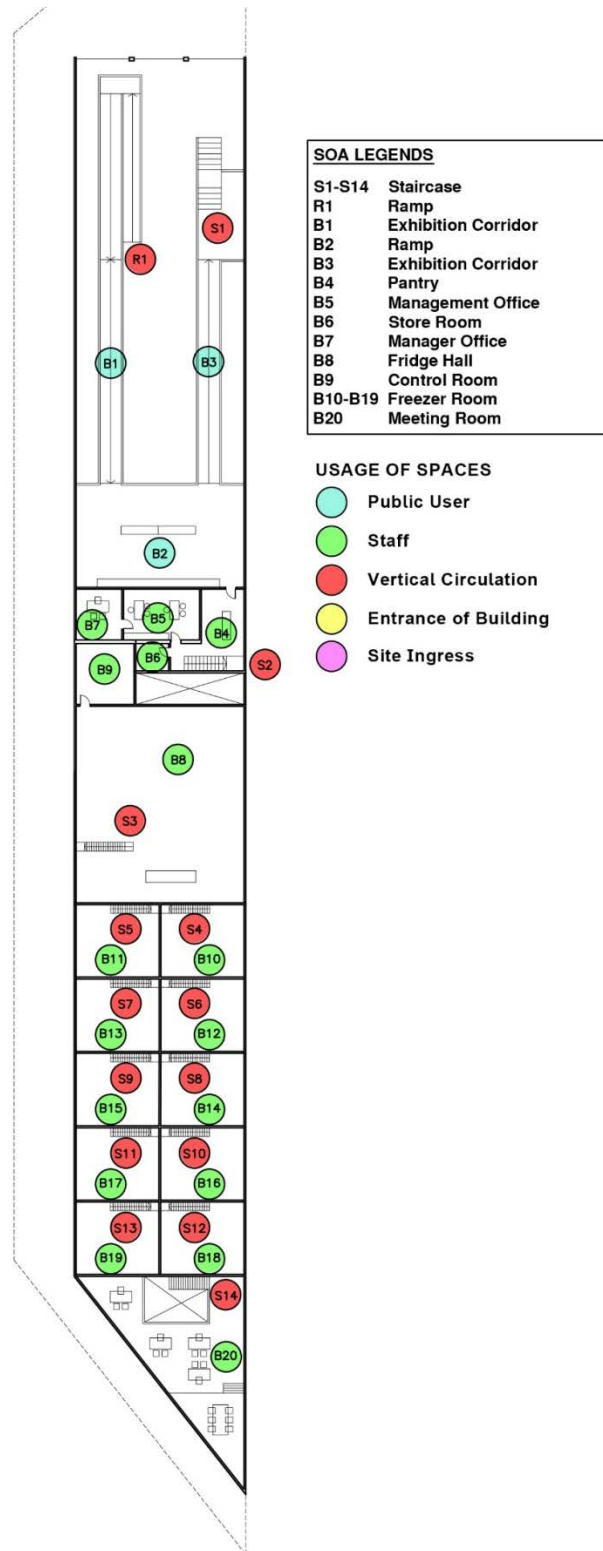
First-floor plan of Fisterra Fish Market, Spain & SOA.
